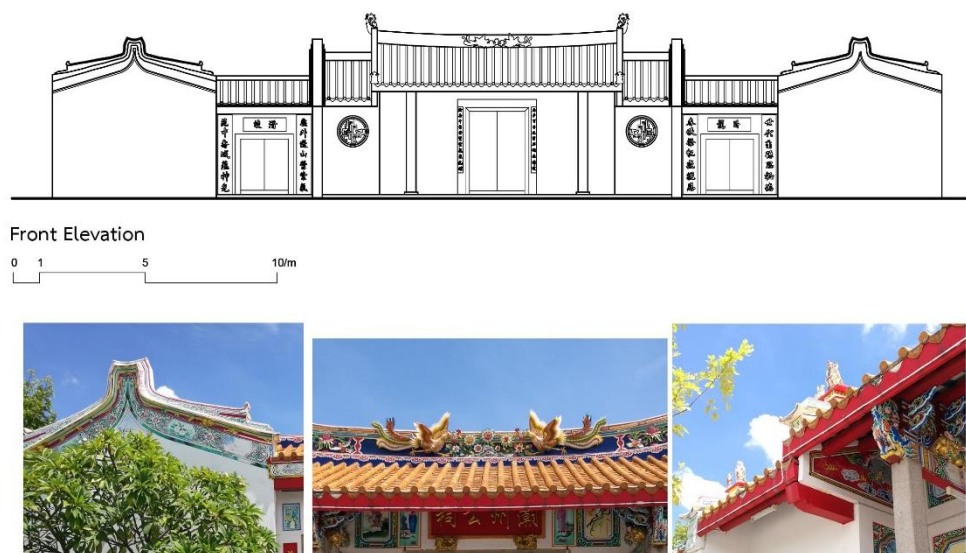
20 The roof form, ornamentation and wall head design of Tio Chew Ancestral Hall.
